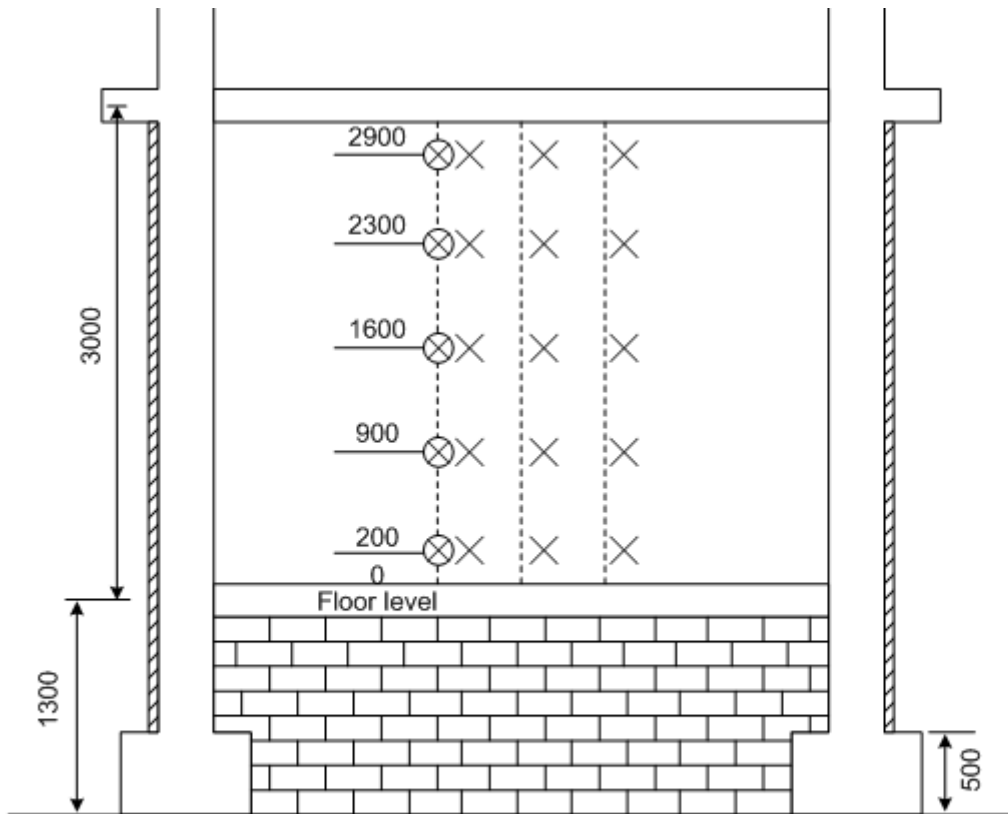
Position of thermocouples in (a) Columns (b) beams and (c) slab (Contd.)
